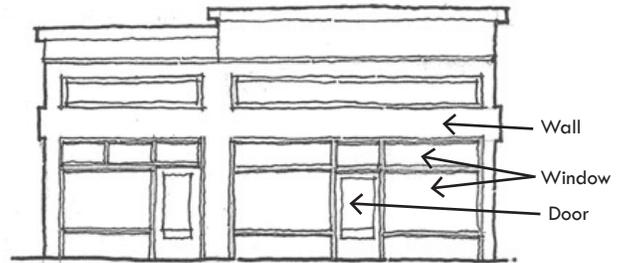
General Facade Treatment. Doors and windows should be located to create an appropriate rhythm of voids and solids along the build facade. The above sketch shows an appropriate door and window configuration and proportion based on a facade configuration.
